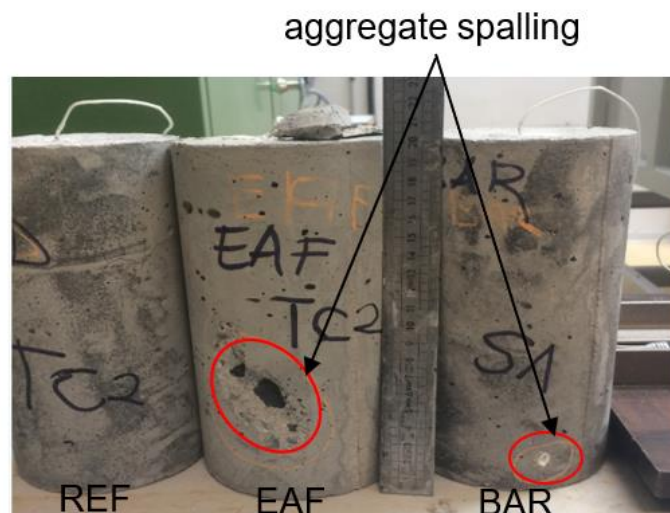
Aggregates spalling phenomenon on EAF and BAR specimens after 10°C/min heating test up to 600°C.
